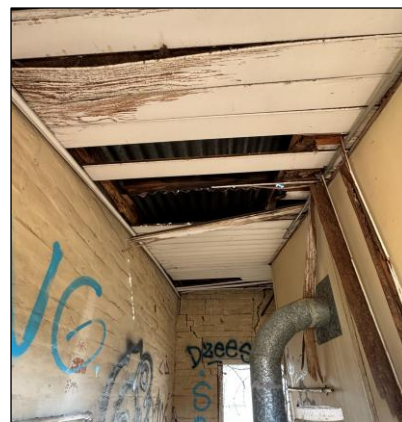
Collapsing boarded ceiling and cracks in brickwork (Apr 26).
